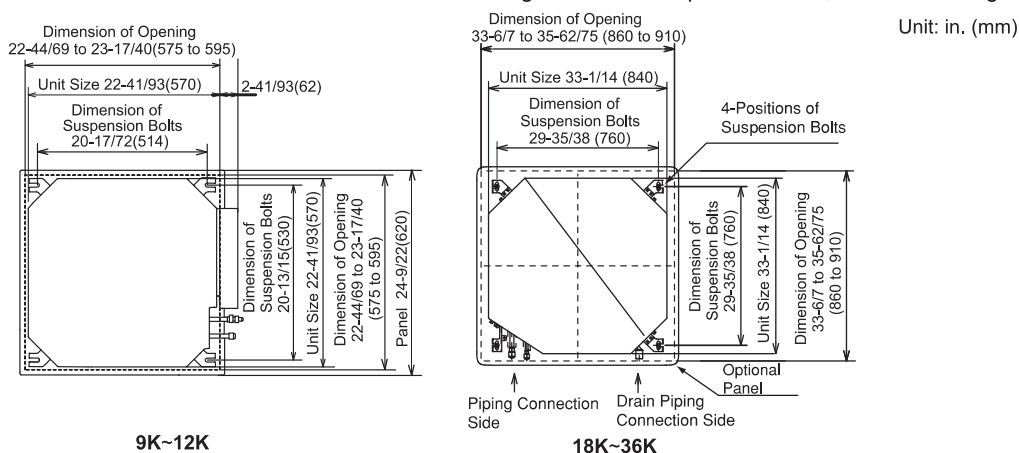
Opening of False Ceiling and Suspension Bolts
